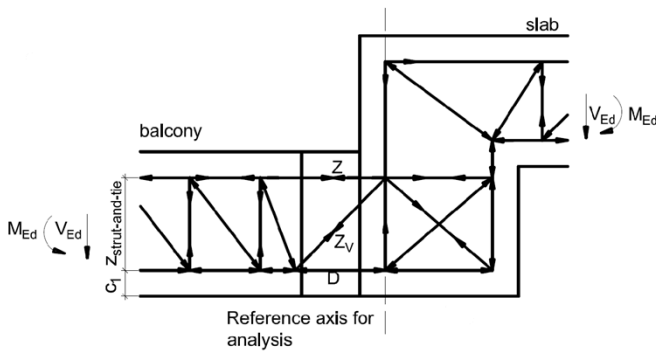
Schöck Isokorb® Type K-U and K-U-F with connection to height offset
